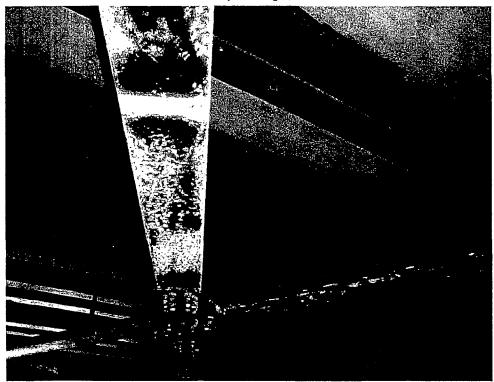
General distress to the underside of the superstructure lift span, typical
